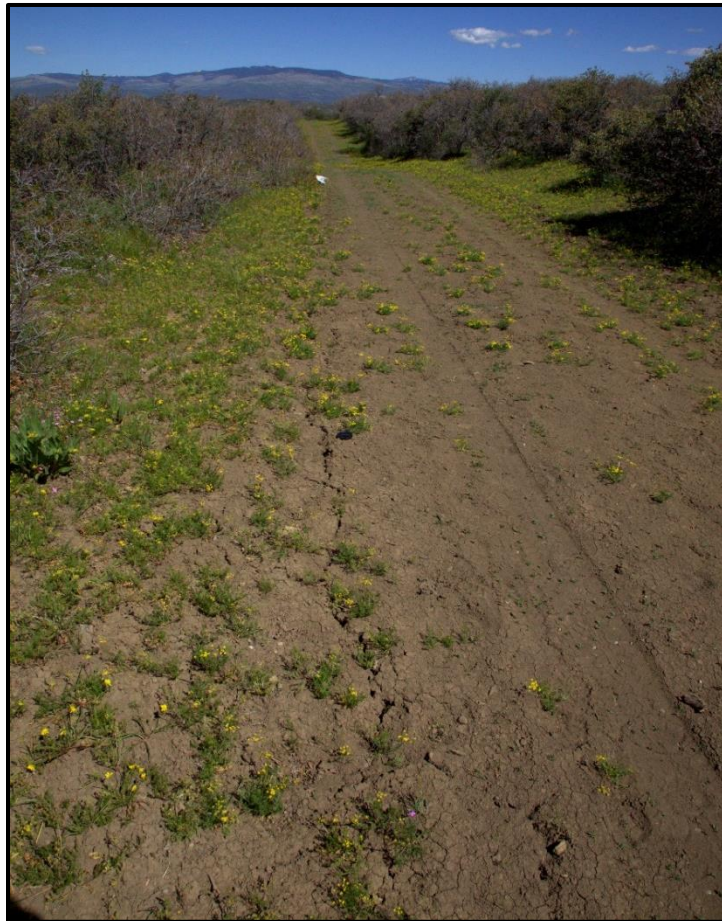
Southeast view of subsidence crack parallel to road on Traverse C-C' located over the E14 Headgate, between crosscuts 23 and 22 during spring 2022 visit.
